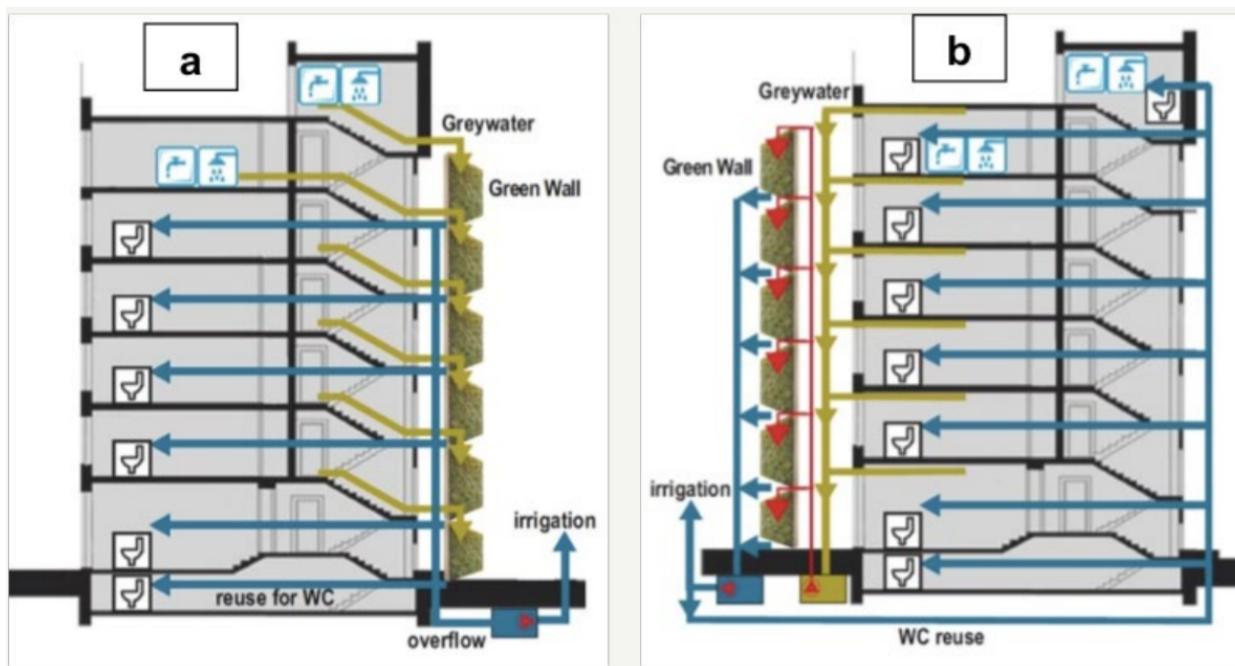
Possible implementation schemes for greywater collection, treatment, and reuse in the same building with green walls: a) floor-by-floor and b) unified.
